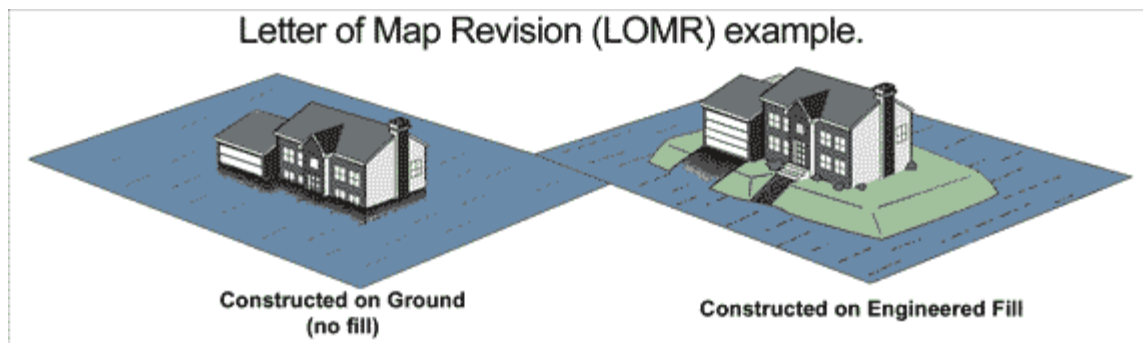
The above illustration shows a house constructed two ways: on the ground with no fill, and on engineered fill, which is an example of a situation requiring LOMR.
